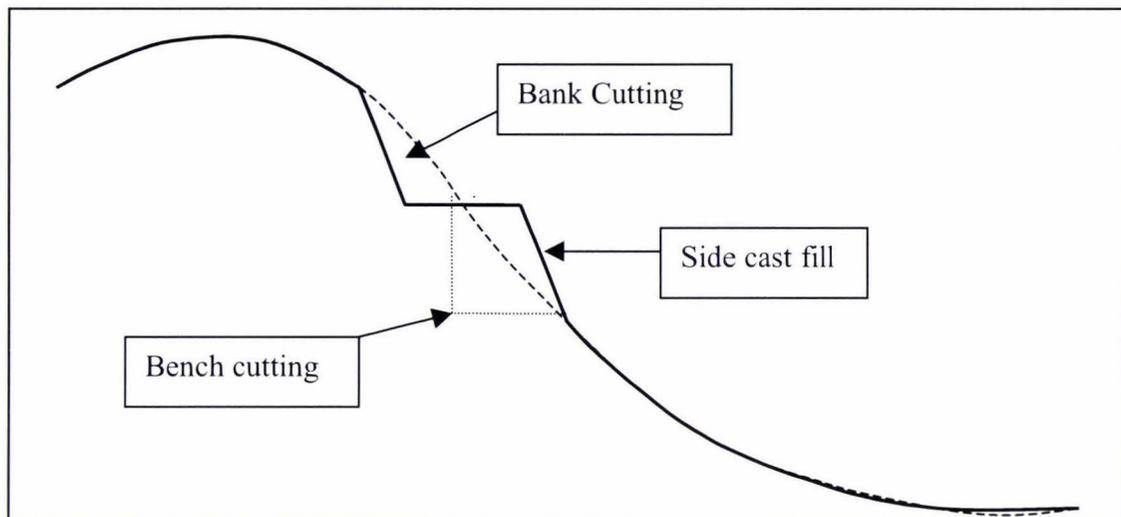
Hillside excavation including bench cutting to form a road skid trail or landing site.
